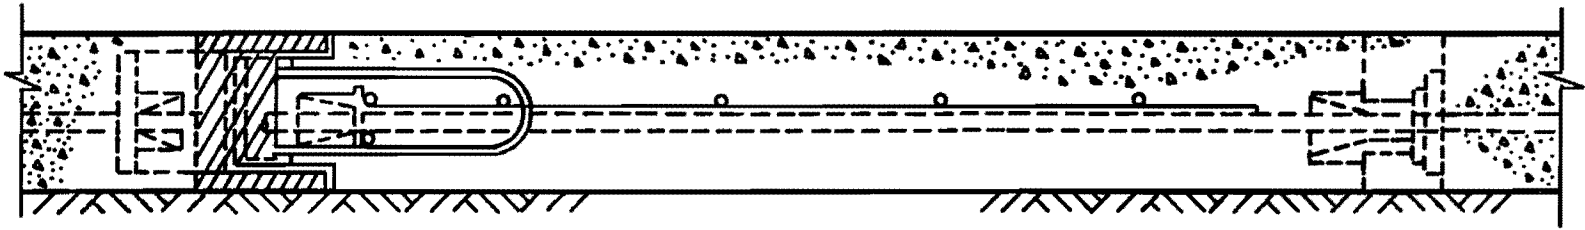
Details of female beam and male face channel for PAJO joint (Ref 56).
